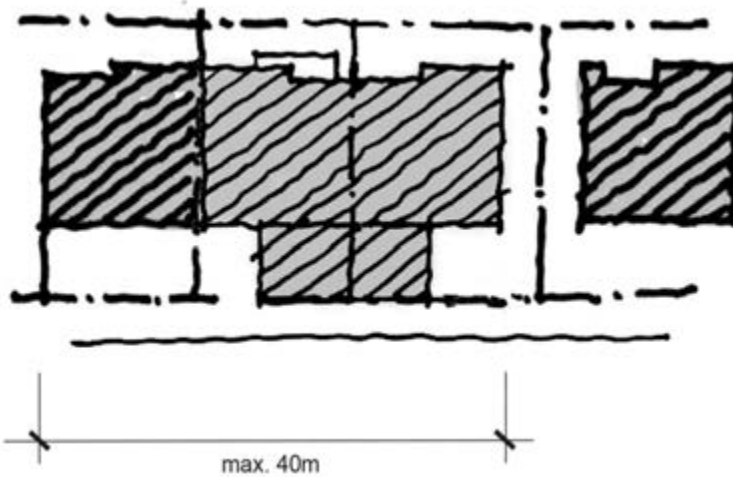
b – Measuring maximum width of multiple adjoining buildings
